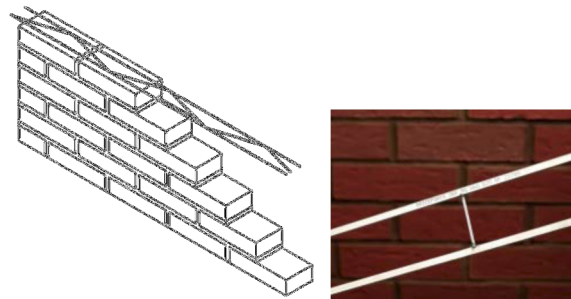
Example of the truss type bed joint reinforcement, redrawn from Drysdale [2008] and ladder type reinforcement.
